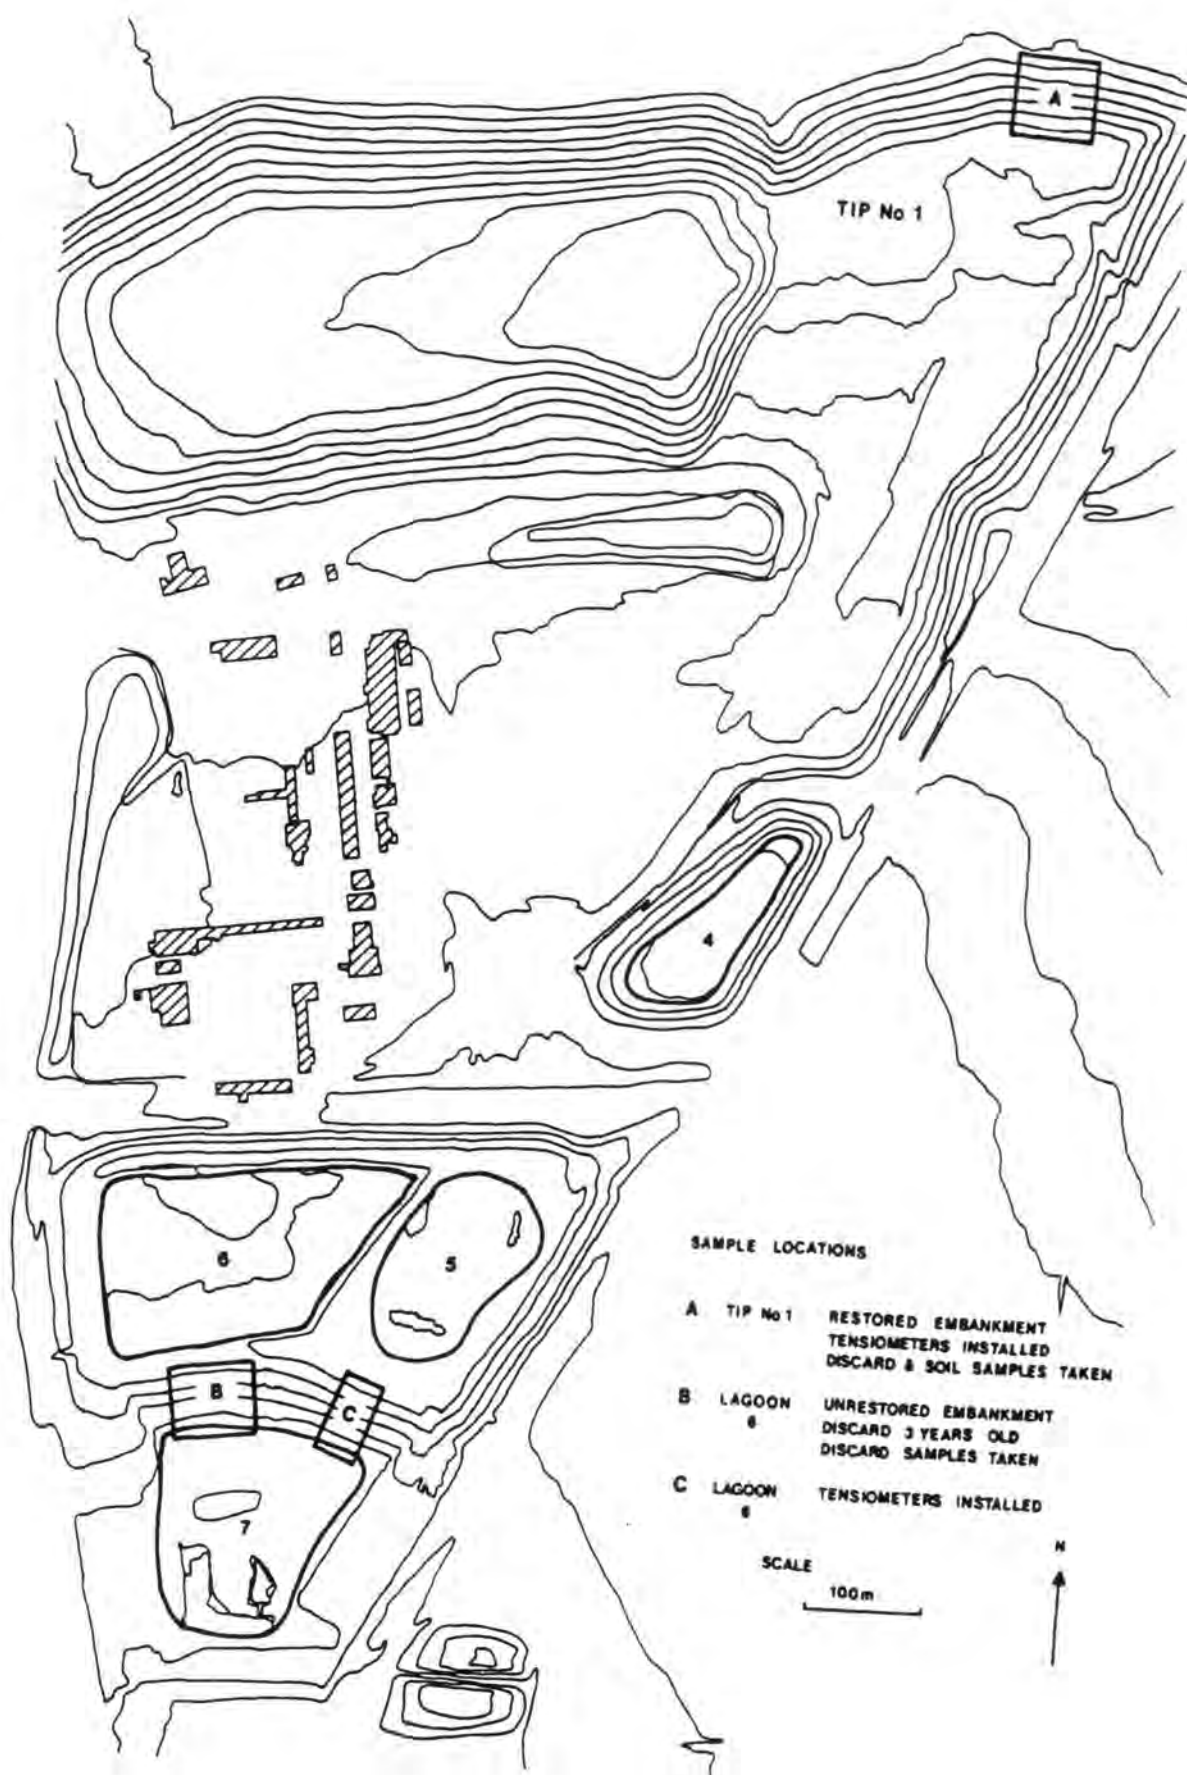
Bilsthorpe Colliery Plan showing locations of sample sites.
